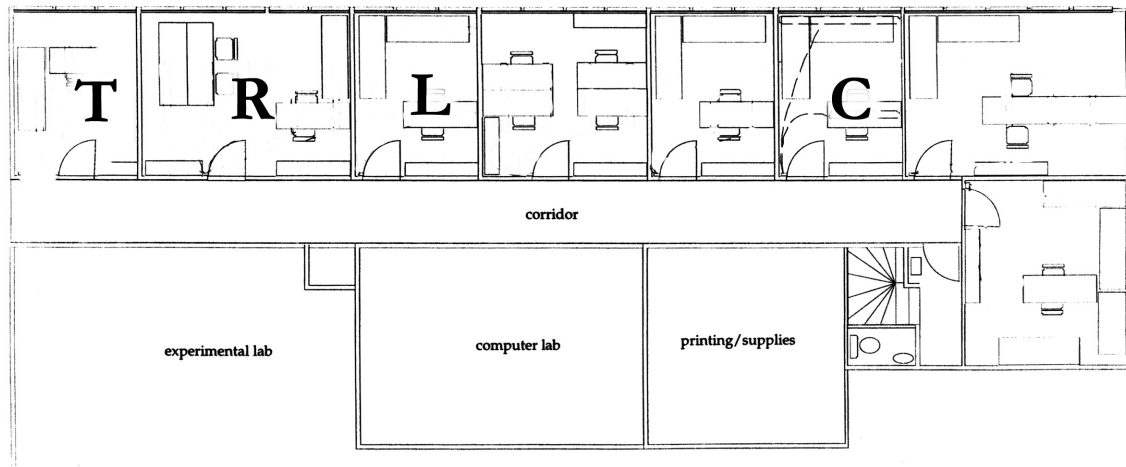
Floor plan showing location of Cases T, R, L, C
